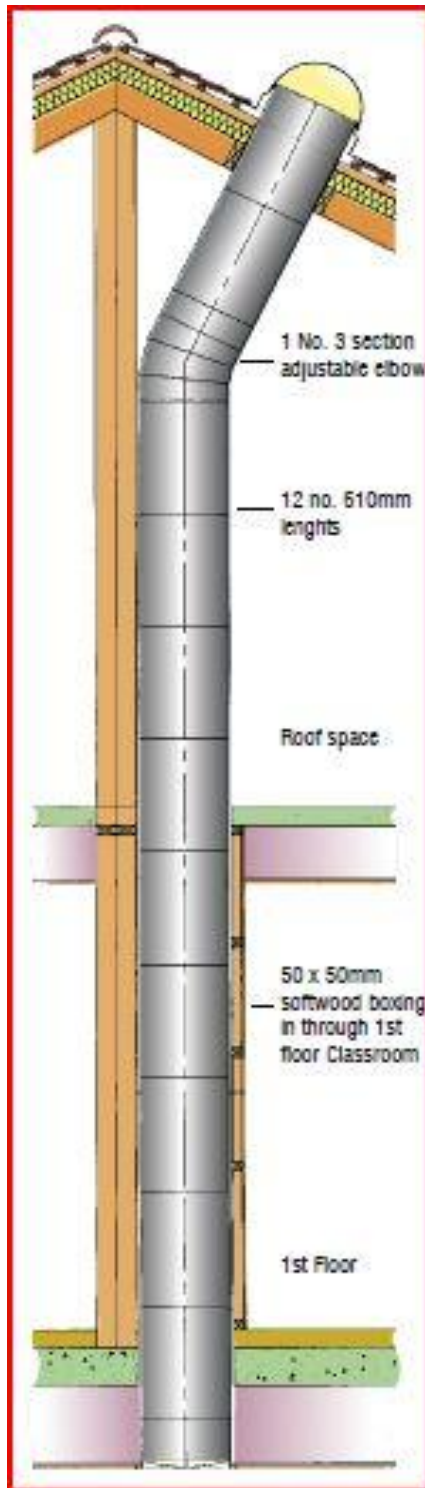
Light Pipe(7.6 m) Serving Ground Floor of South Charnwood School in USA
